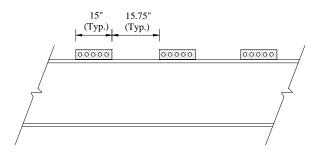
Perfobond ribs on top flangeof steel beam (1 in.= 25.4 mm)
